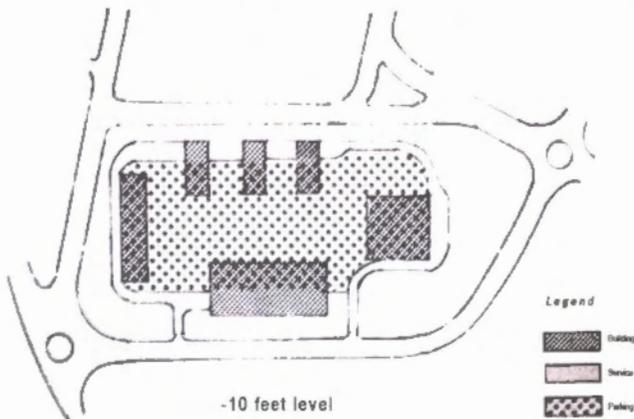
proposed development – at -10 feet level for service facilities and parking
